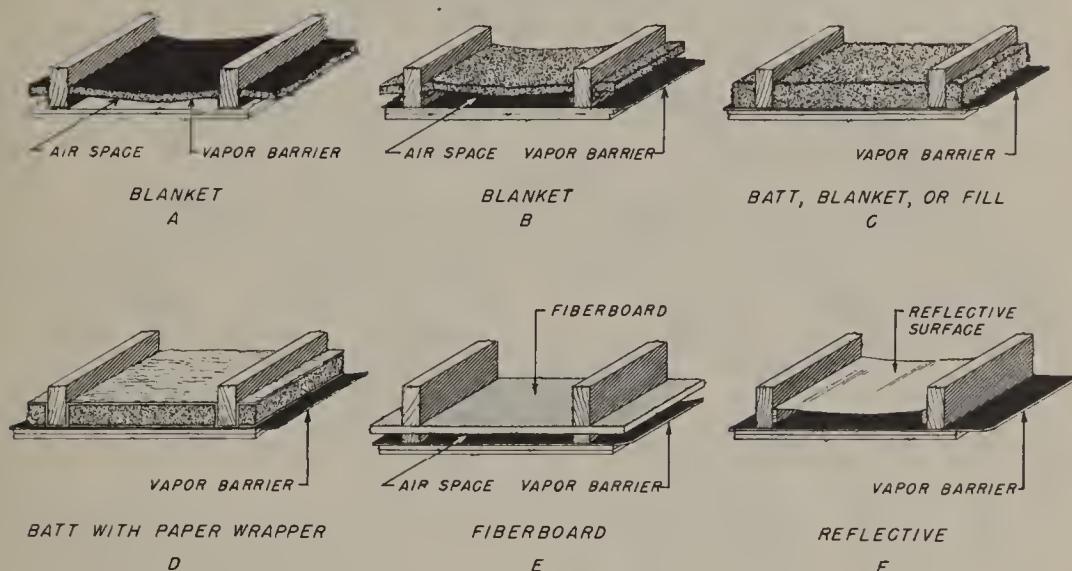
Alternate subceiling details.* These details are suitable for use in ceiling constructions similar to that shown in figure 43. The sketches show the use of vapor barriers for condensation control and the arrangement of several types of thermal insulation. Air spaces should be used wherever practical, and always when reflective-type insulation is employed. That shown in detail F could be surfaced two sides and the vapor barrier could be metallic-surfaced paper or metallic-surfaced gypsum board. The upper surface of the reflective surface may be impaired in time by dust collection when used in a detail such as shown in figure 43.
